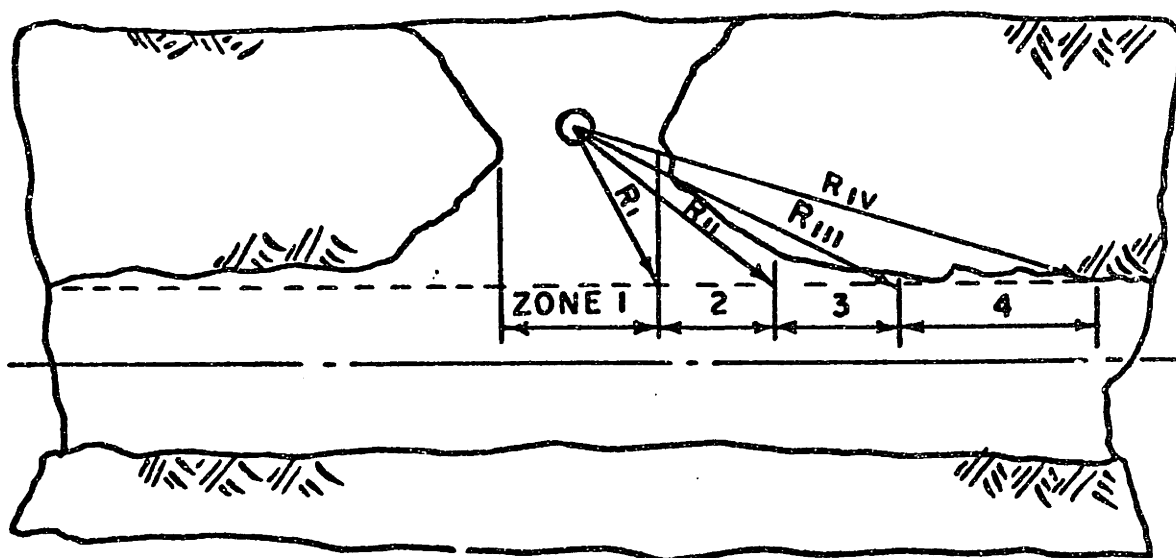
Empirically Determined Tunnel Damage Zones
